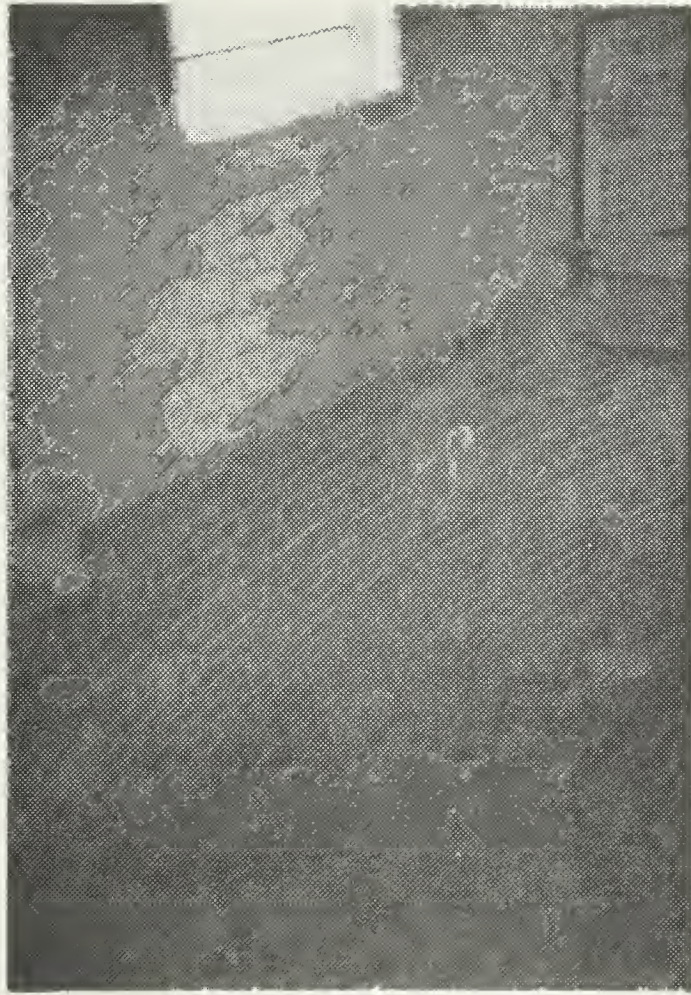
A. East St. Louis Waterworks, Interior Pit, 1980.
